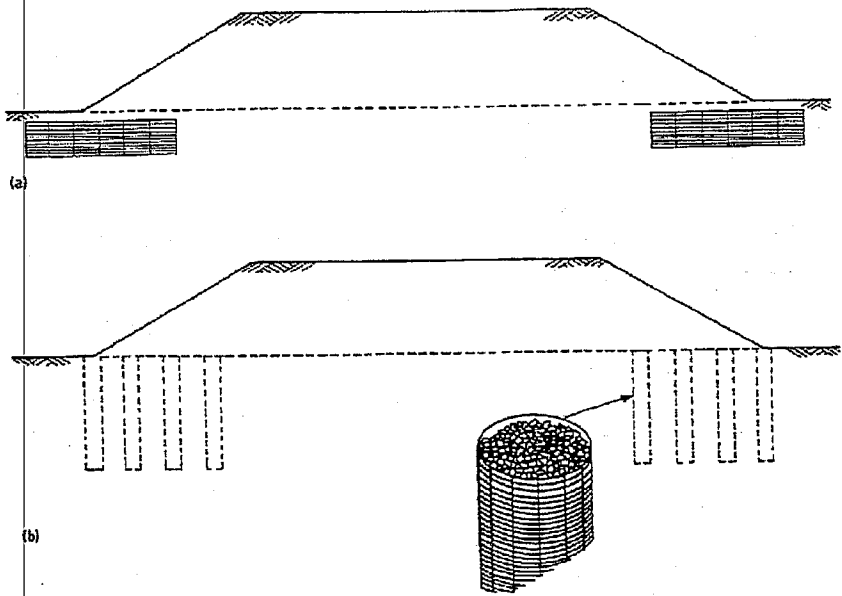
Geogrid reinforcement (a) and stone column formed geogrid tubes (b) beneath embankment
